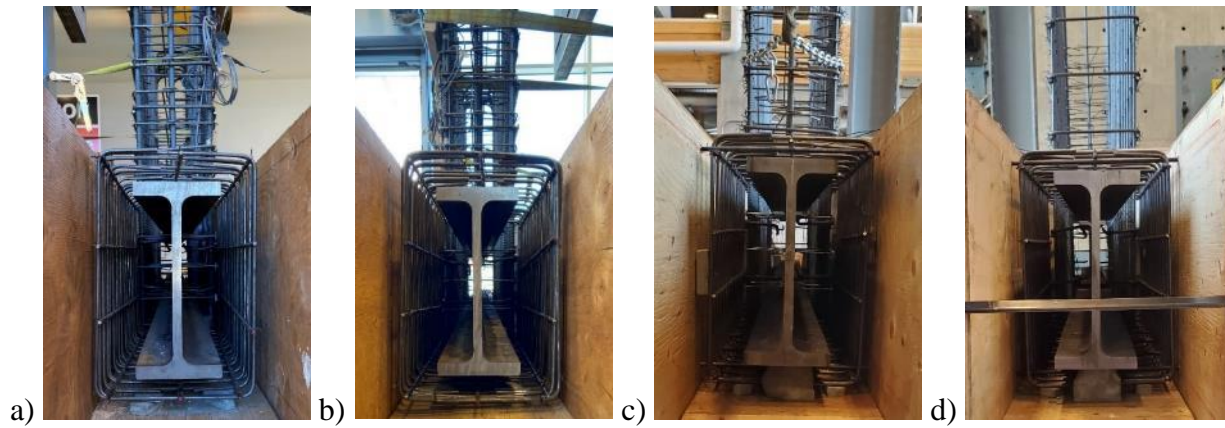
Photo of Coupling Beam Cross-Sections for a) SRC-W1, b) SRC-W2, c) SRC-W3, and d) SRC-W4
